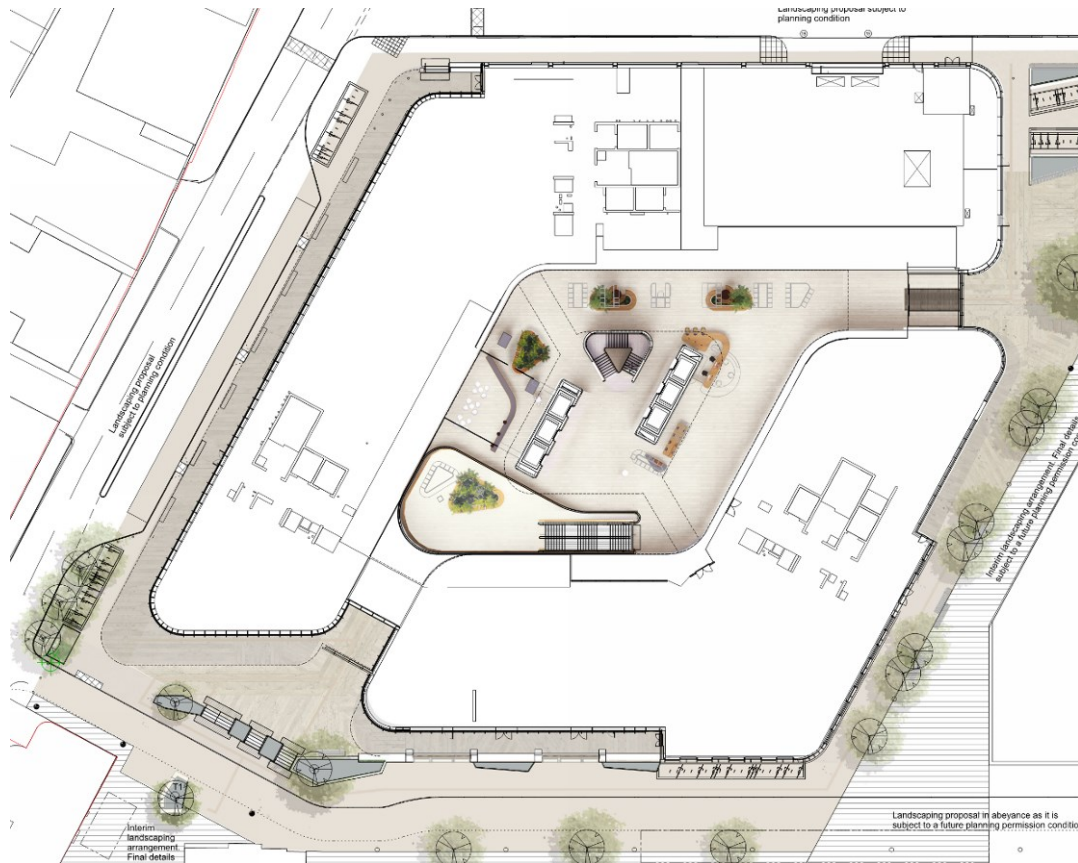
landscaping plan showing areas of new publicly accessible open space / walking route to be provided (note options for future development of wider site shown indicatively to the east)
